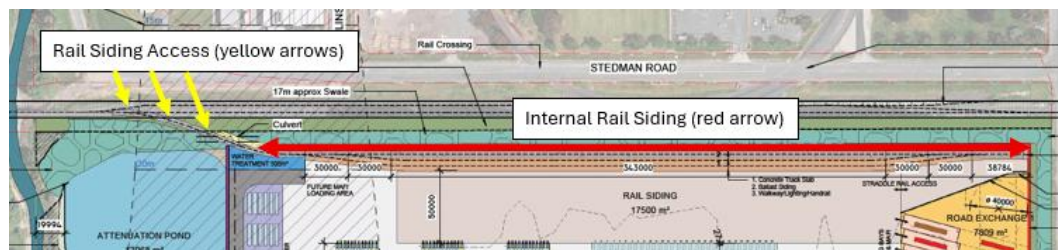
Concept Plan Showing Location and Context of the Rail Siding
